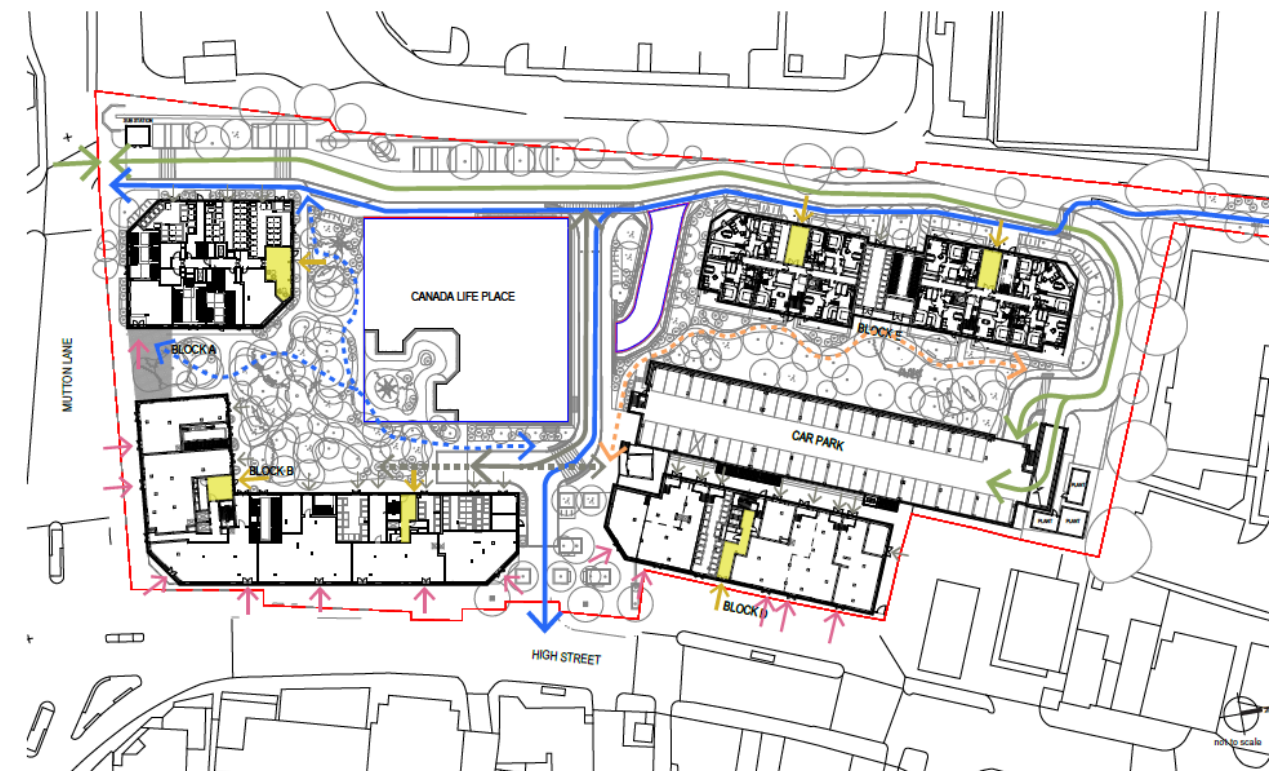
Extract of proposed Movement and Access Layout for Proposed Development on Site (AFK Studios)
